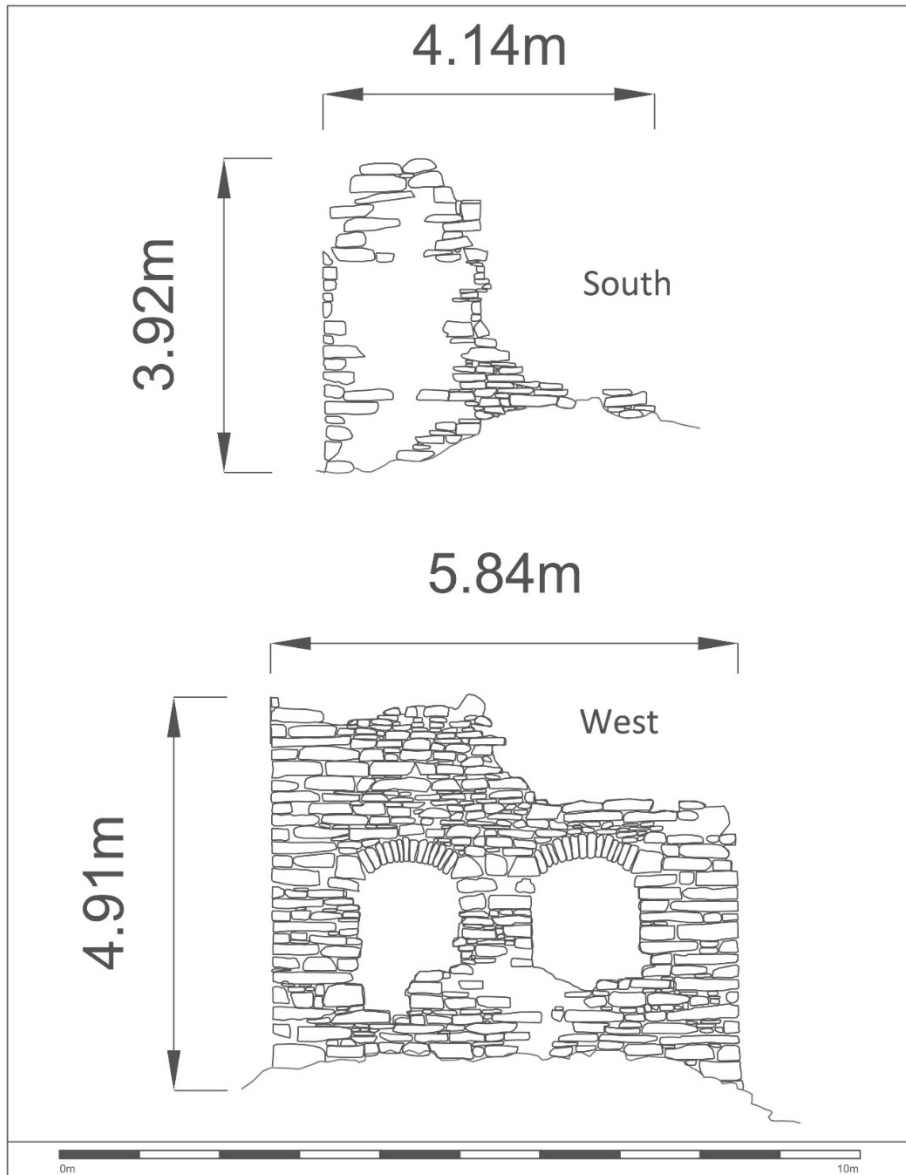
Southern and western External elevations of the south and west walls of the signal tower at Horn Head Signal Station.
